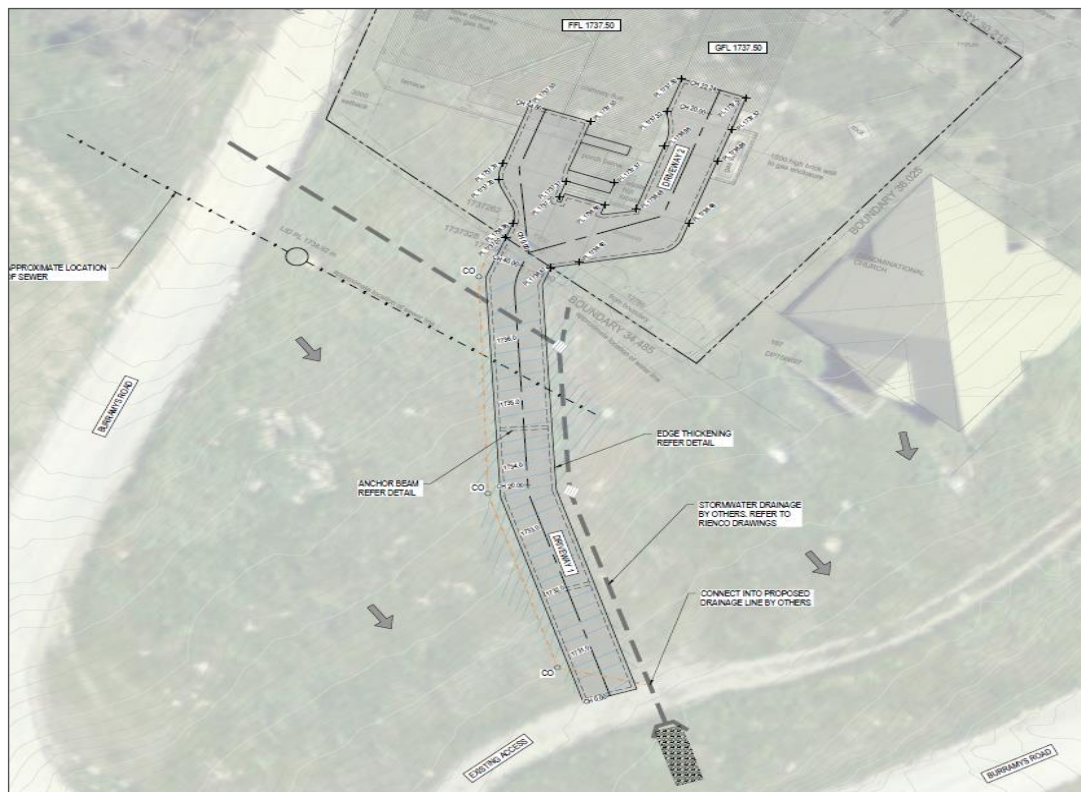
| Proposed access driveway to main entry / garage area (Source: Applicant's documentation)
